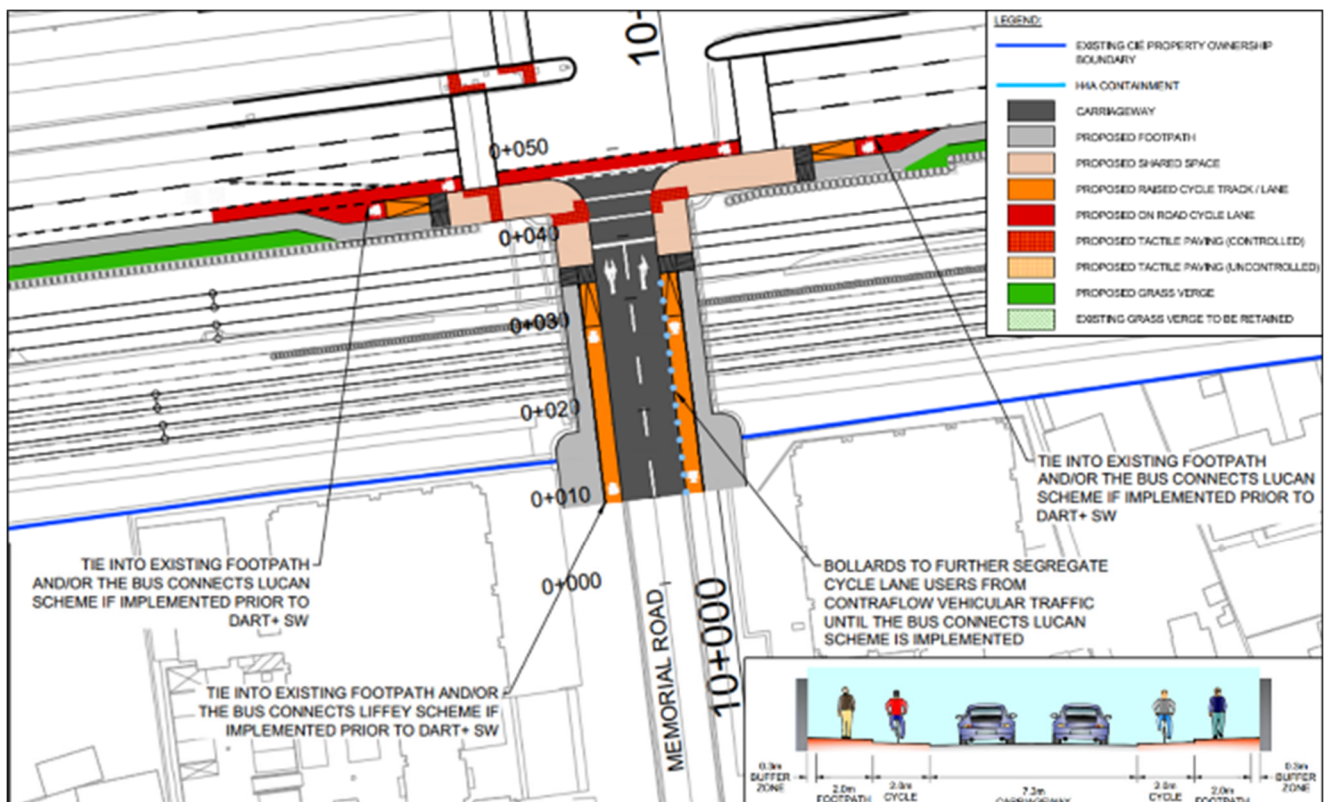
Memorial Road - Potential Area of Road and Footpath Resurfacing
